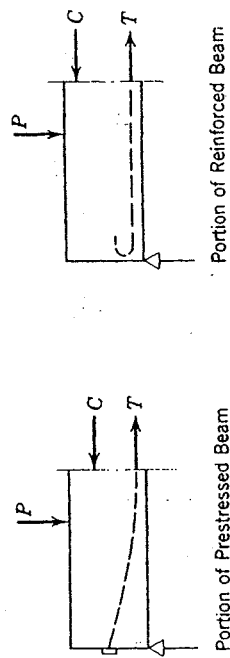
Internal resisting moment in prestressed- and reinforced-concrete beams.
